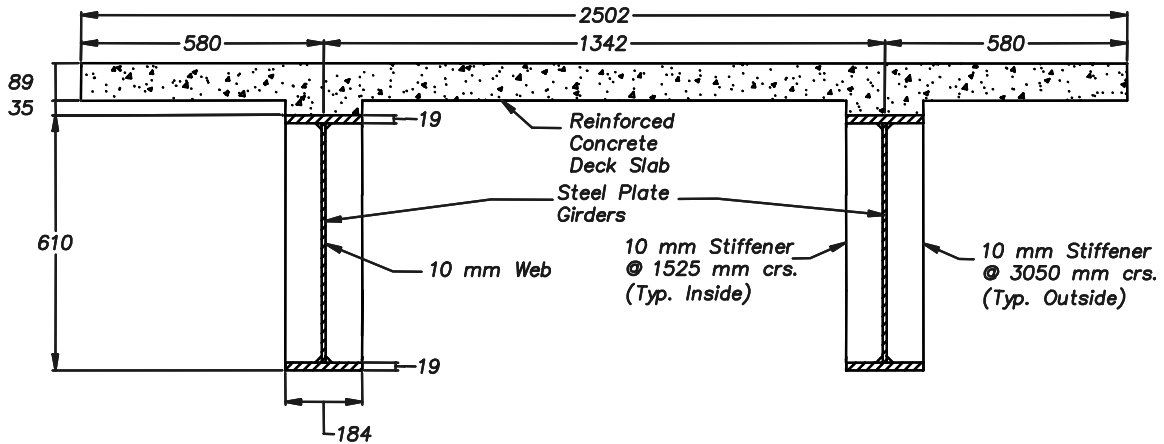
Steel slab-on-girder bridge superstructure model.
